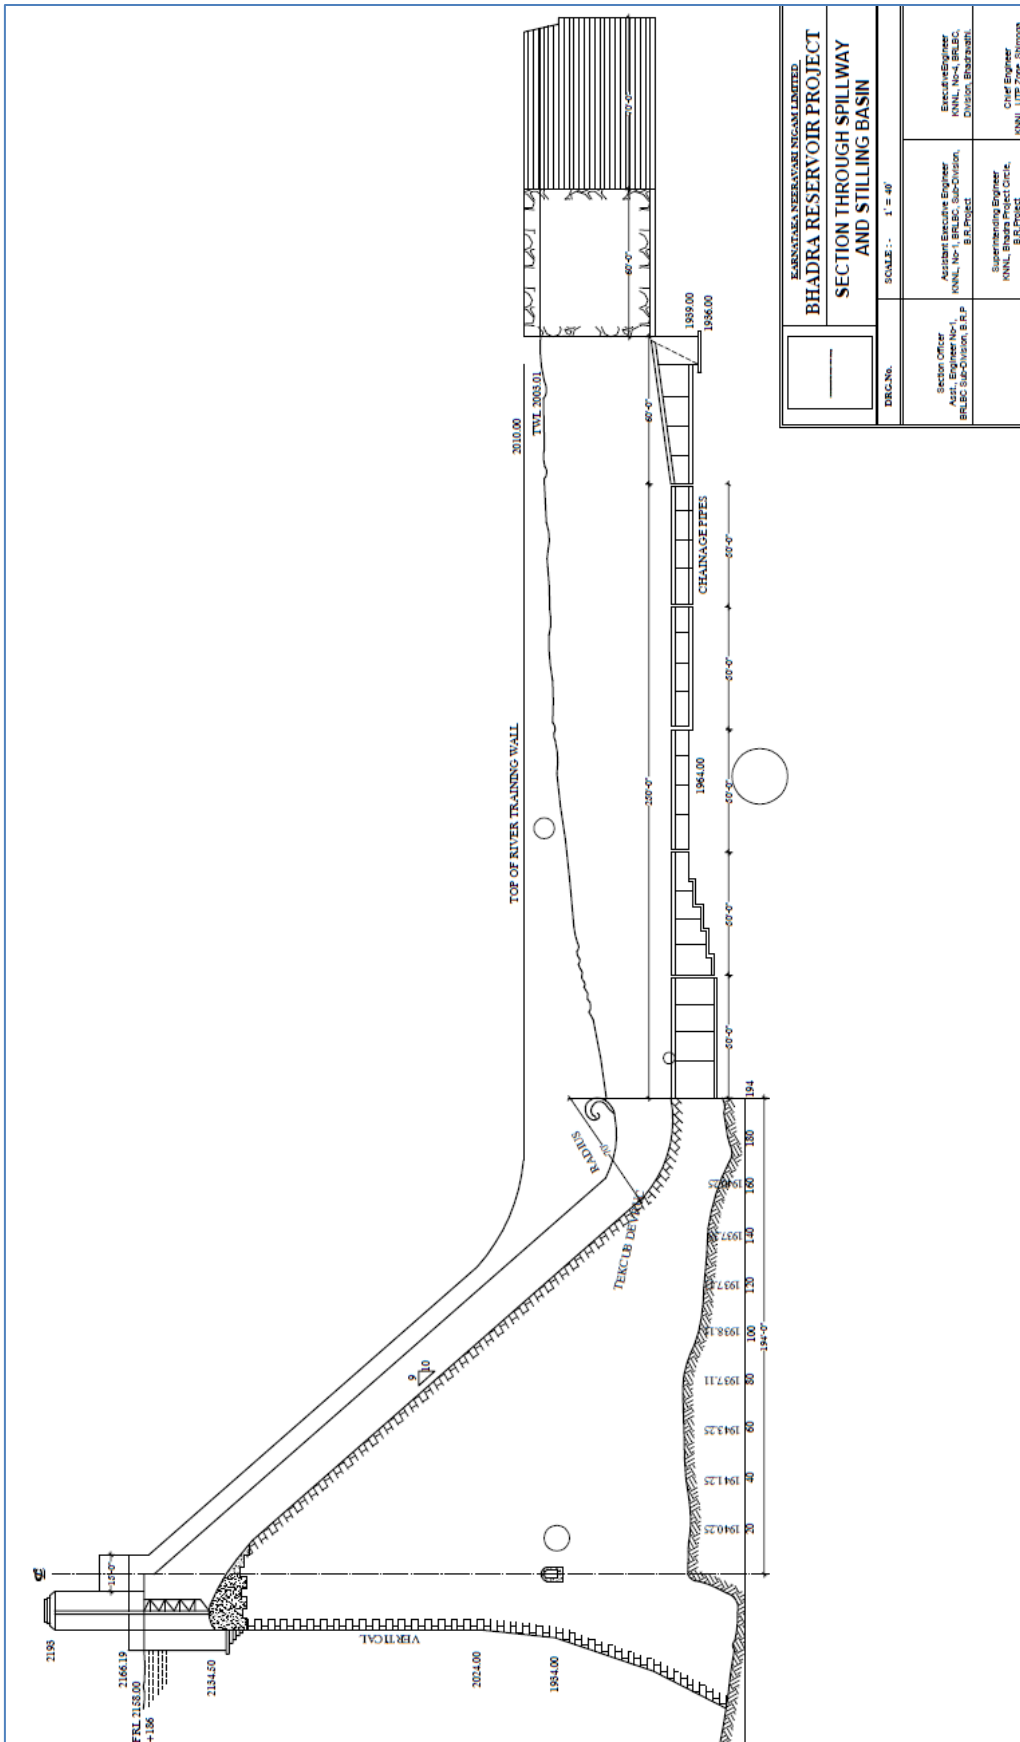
Spillway cross section of Bhadra Dam. Source: Bhadra reservoir project.
